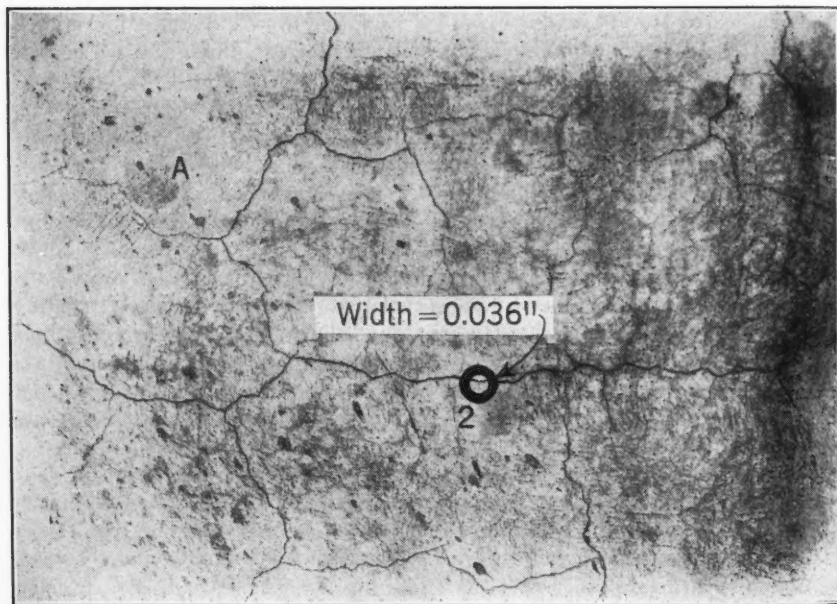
TYPICAL RANDOM-PATTERN CRACKING OF THE PARKER DAM SURFACE CONCRETE AS A RESULT OF INTERNAL EXPANSION
